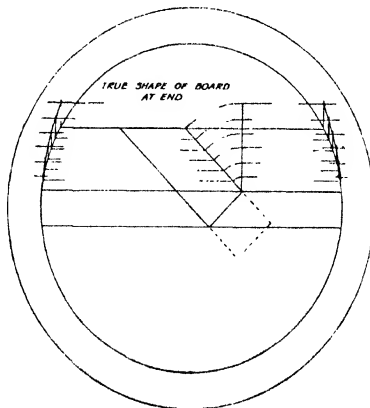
Showing true Shape of Louvre Boards in a Bull's Eye Frame.
